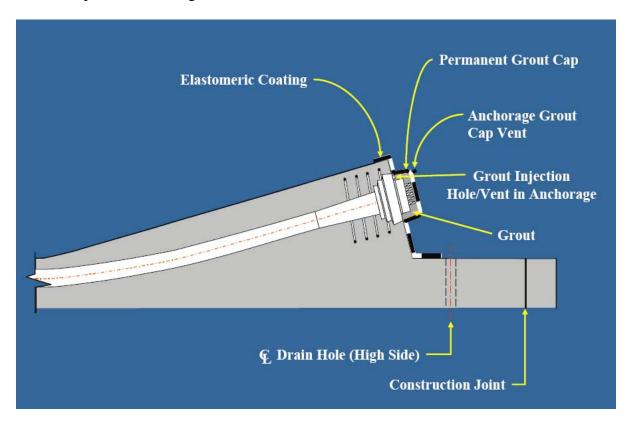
Multilayer Protection of Internal Tendon Anchorage
